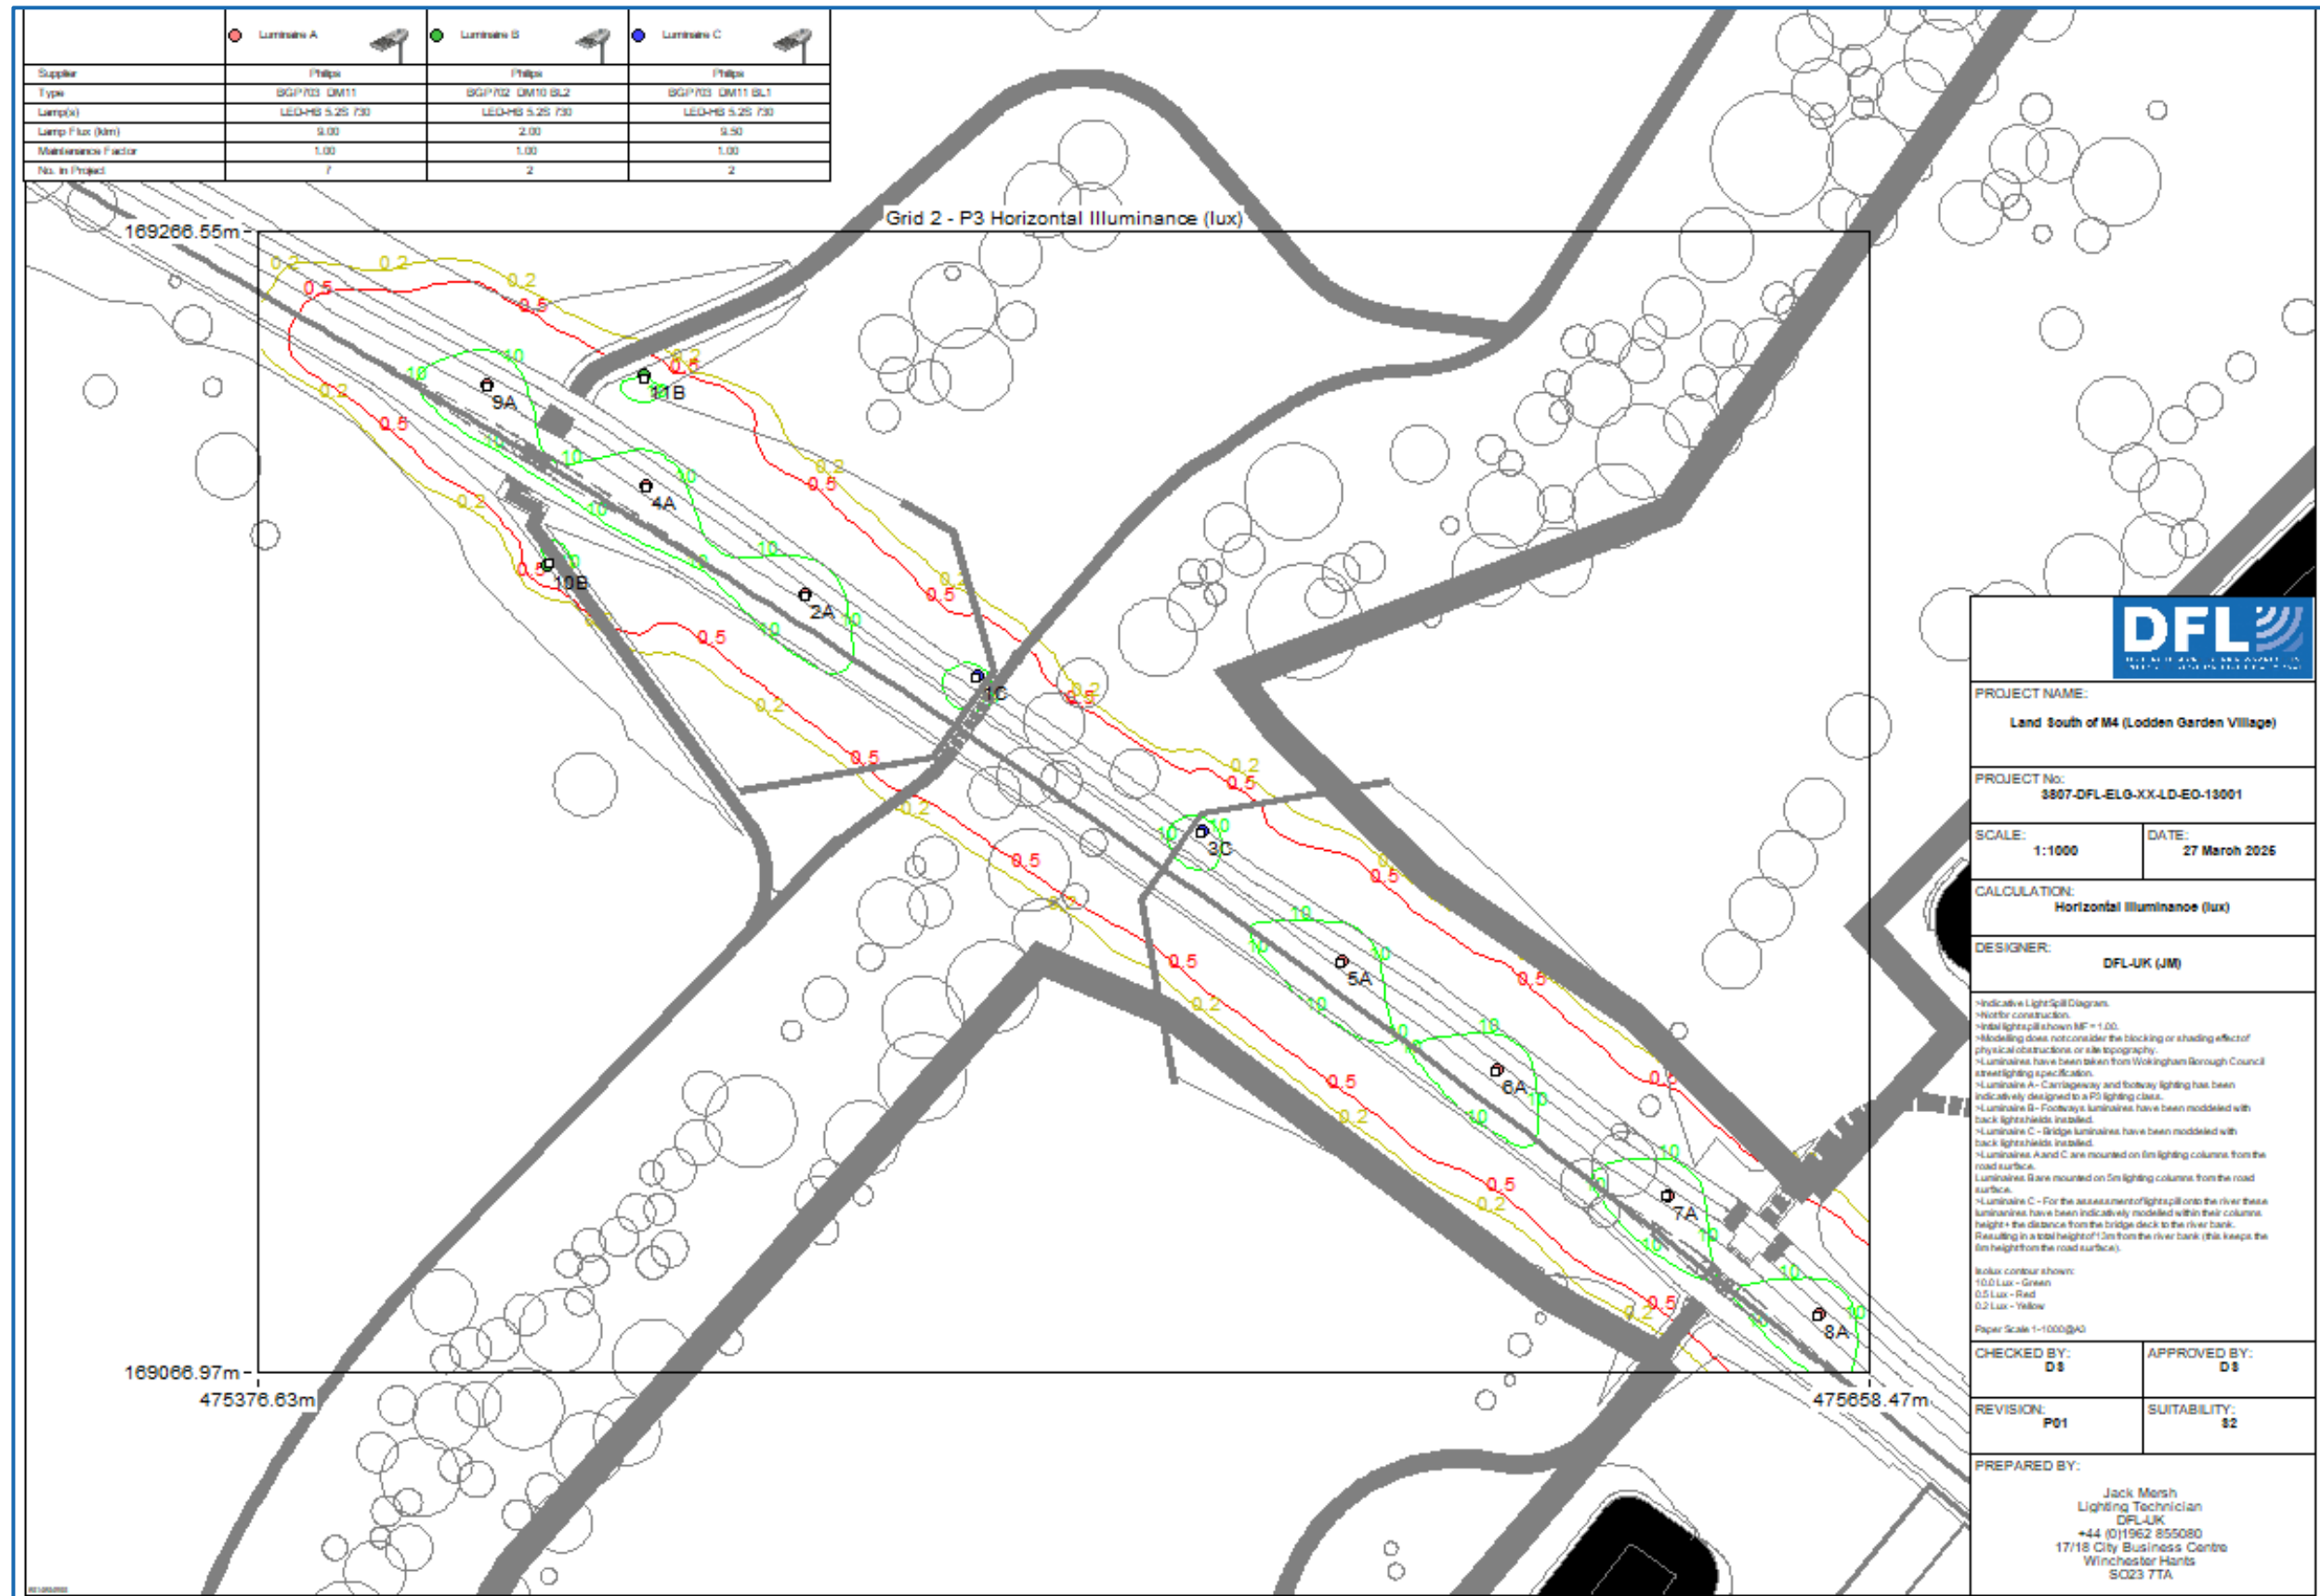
Bridge Crossing Standard Approach Indicative Light Spill Diagram (WIP)
